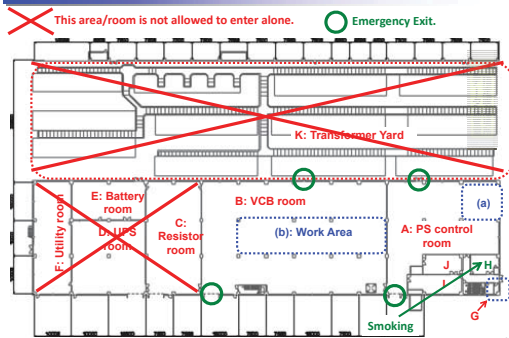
Ground Floor of JT-60 Rectifier Building and Transformer Yard.
